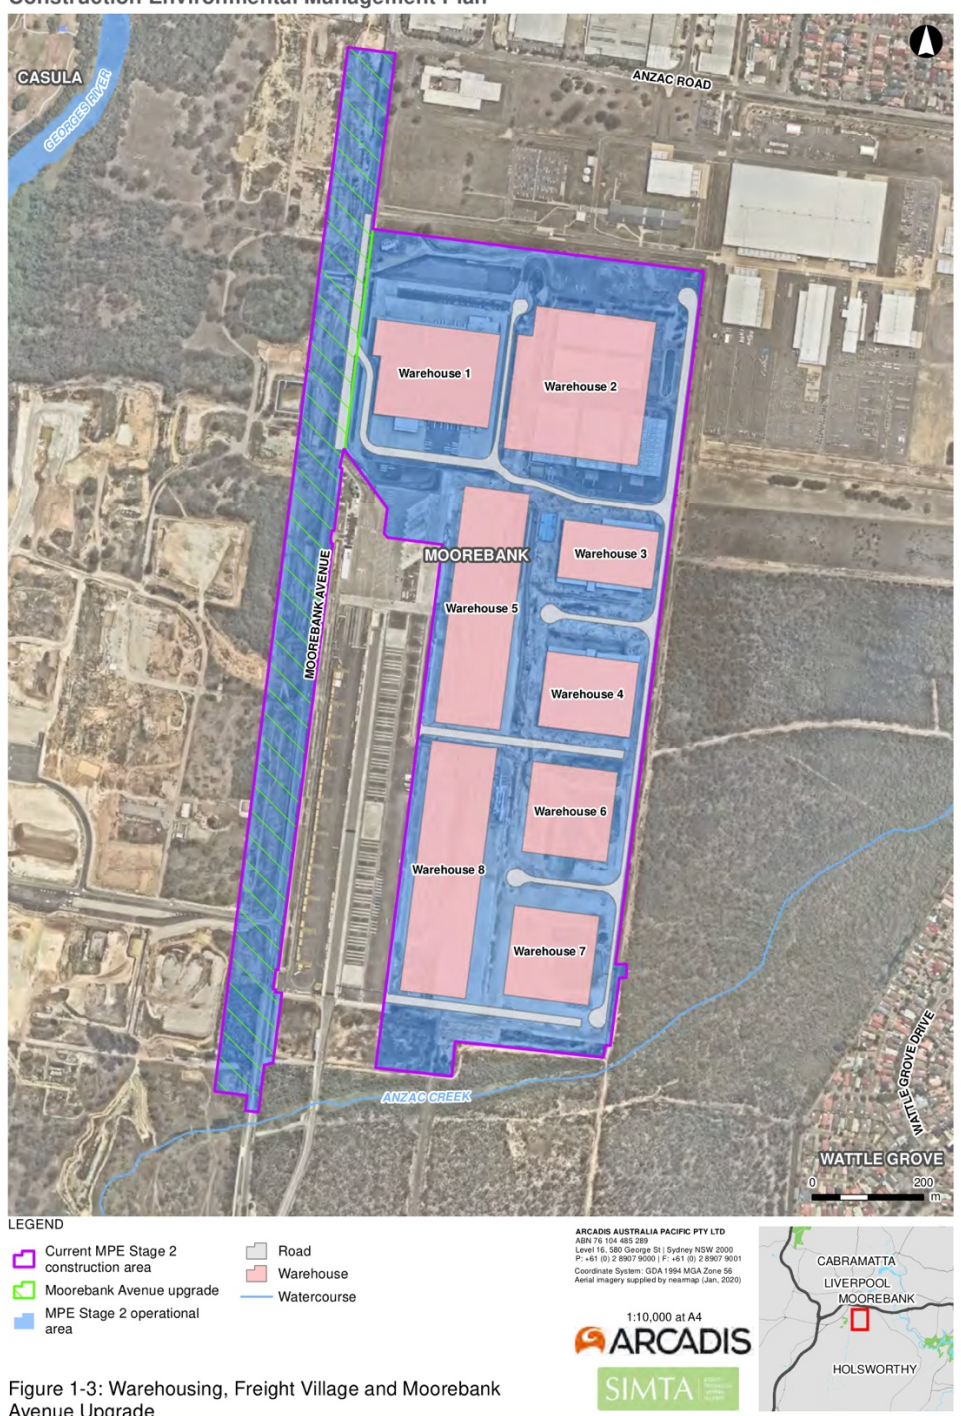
Warehousing, Freight Village and Moorebank Avenue Upgrade
